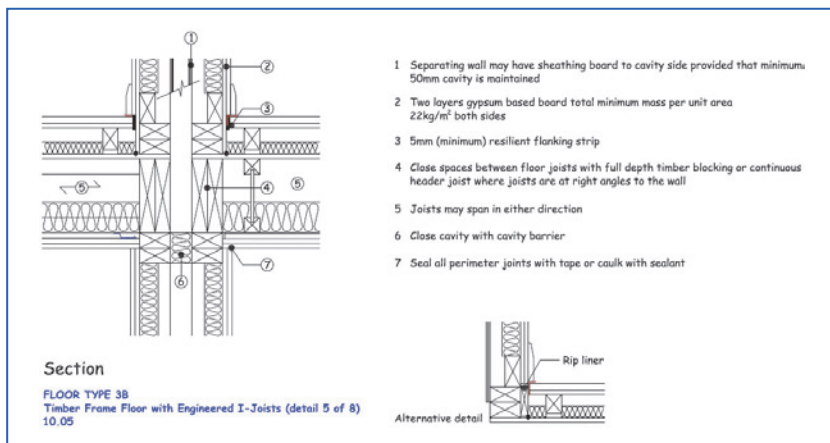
Example of a timber frame floor with Engineered I – joists.
